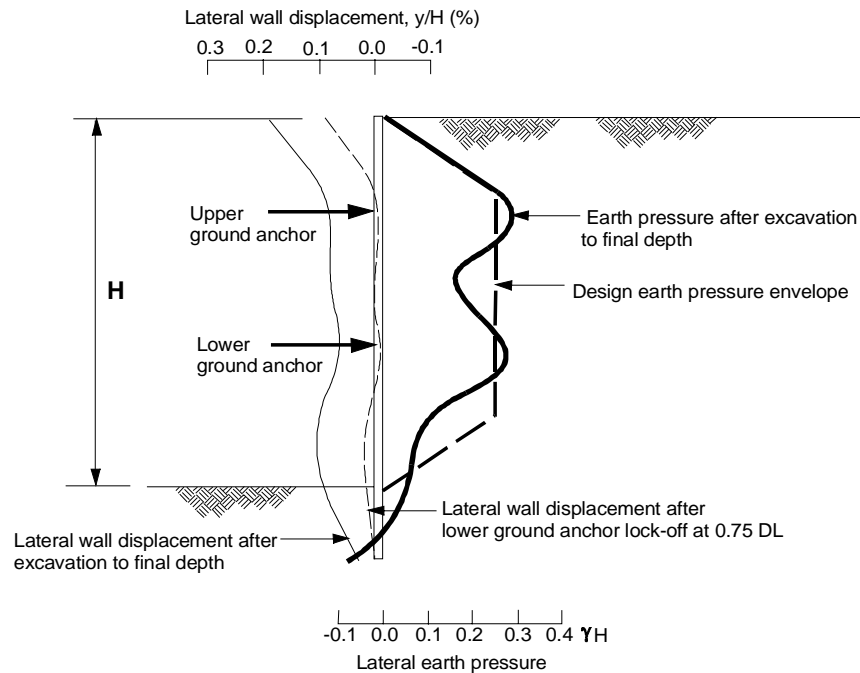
Lateral wall movements and earth pressures with excavation at design grade (modified after FHWA-RD-98-067, 1998).
